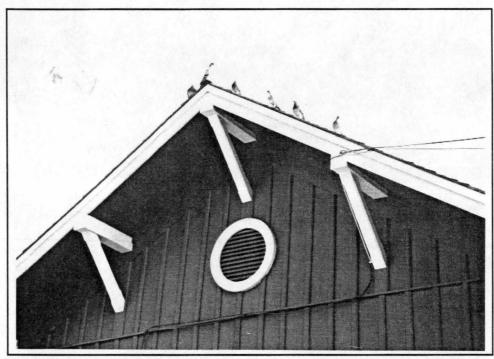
Detail of gable with knee-brace brackets, circular vent, board and batten siding
